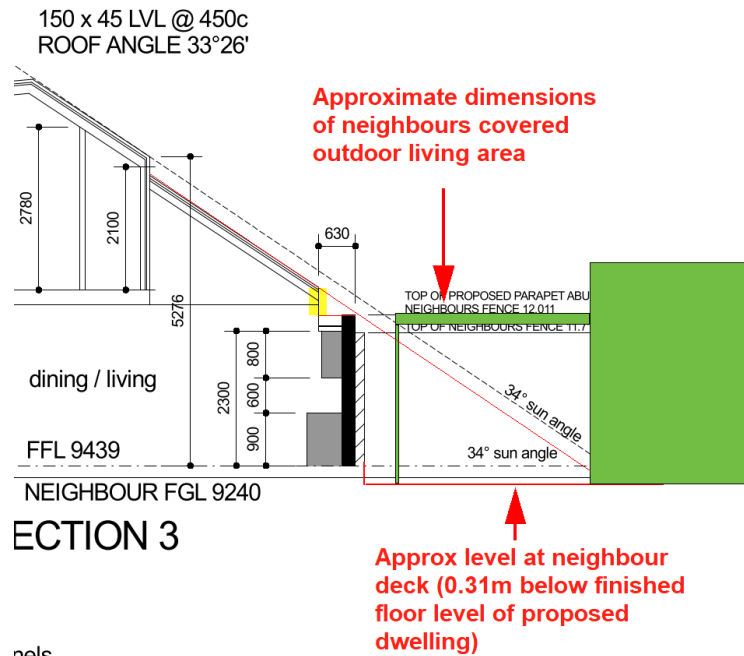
Cross section demonstrating impact of south lot boundary setback variation (section of wall subject of this assessment highlighted).
